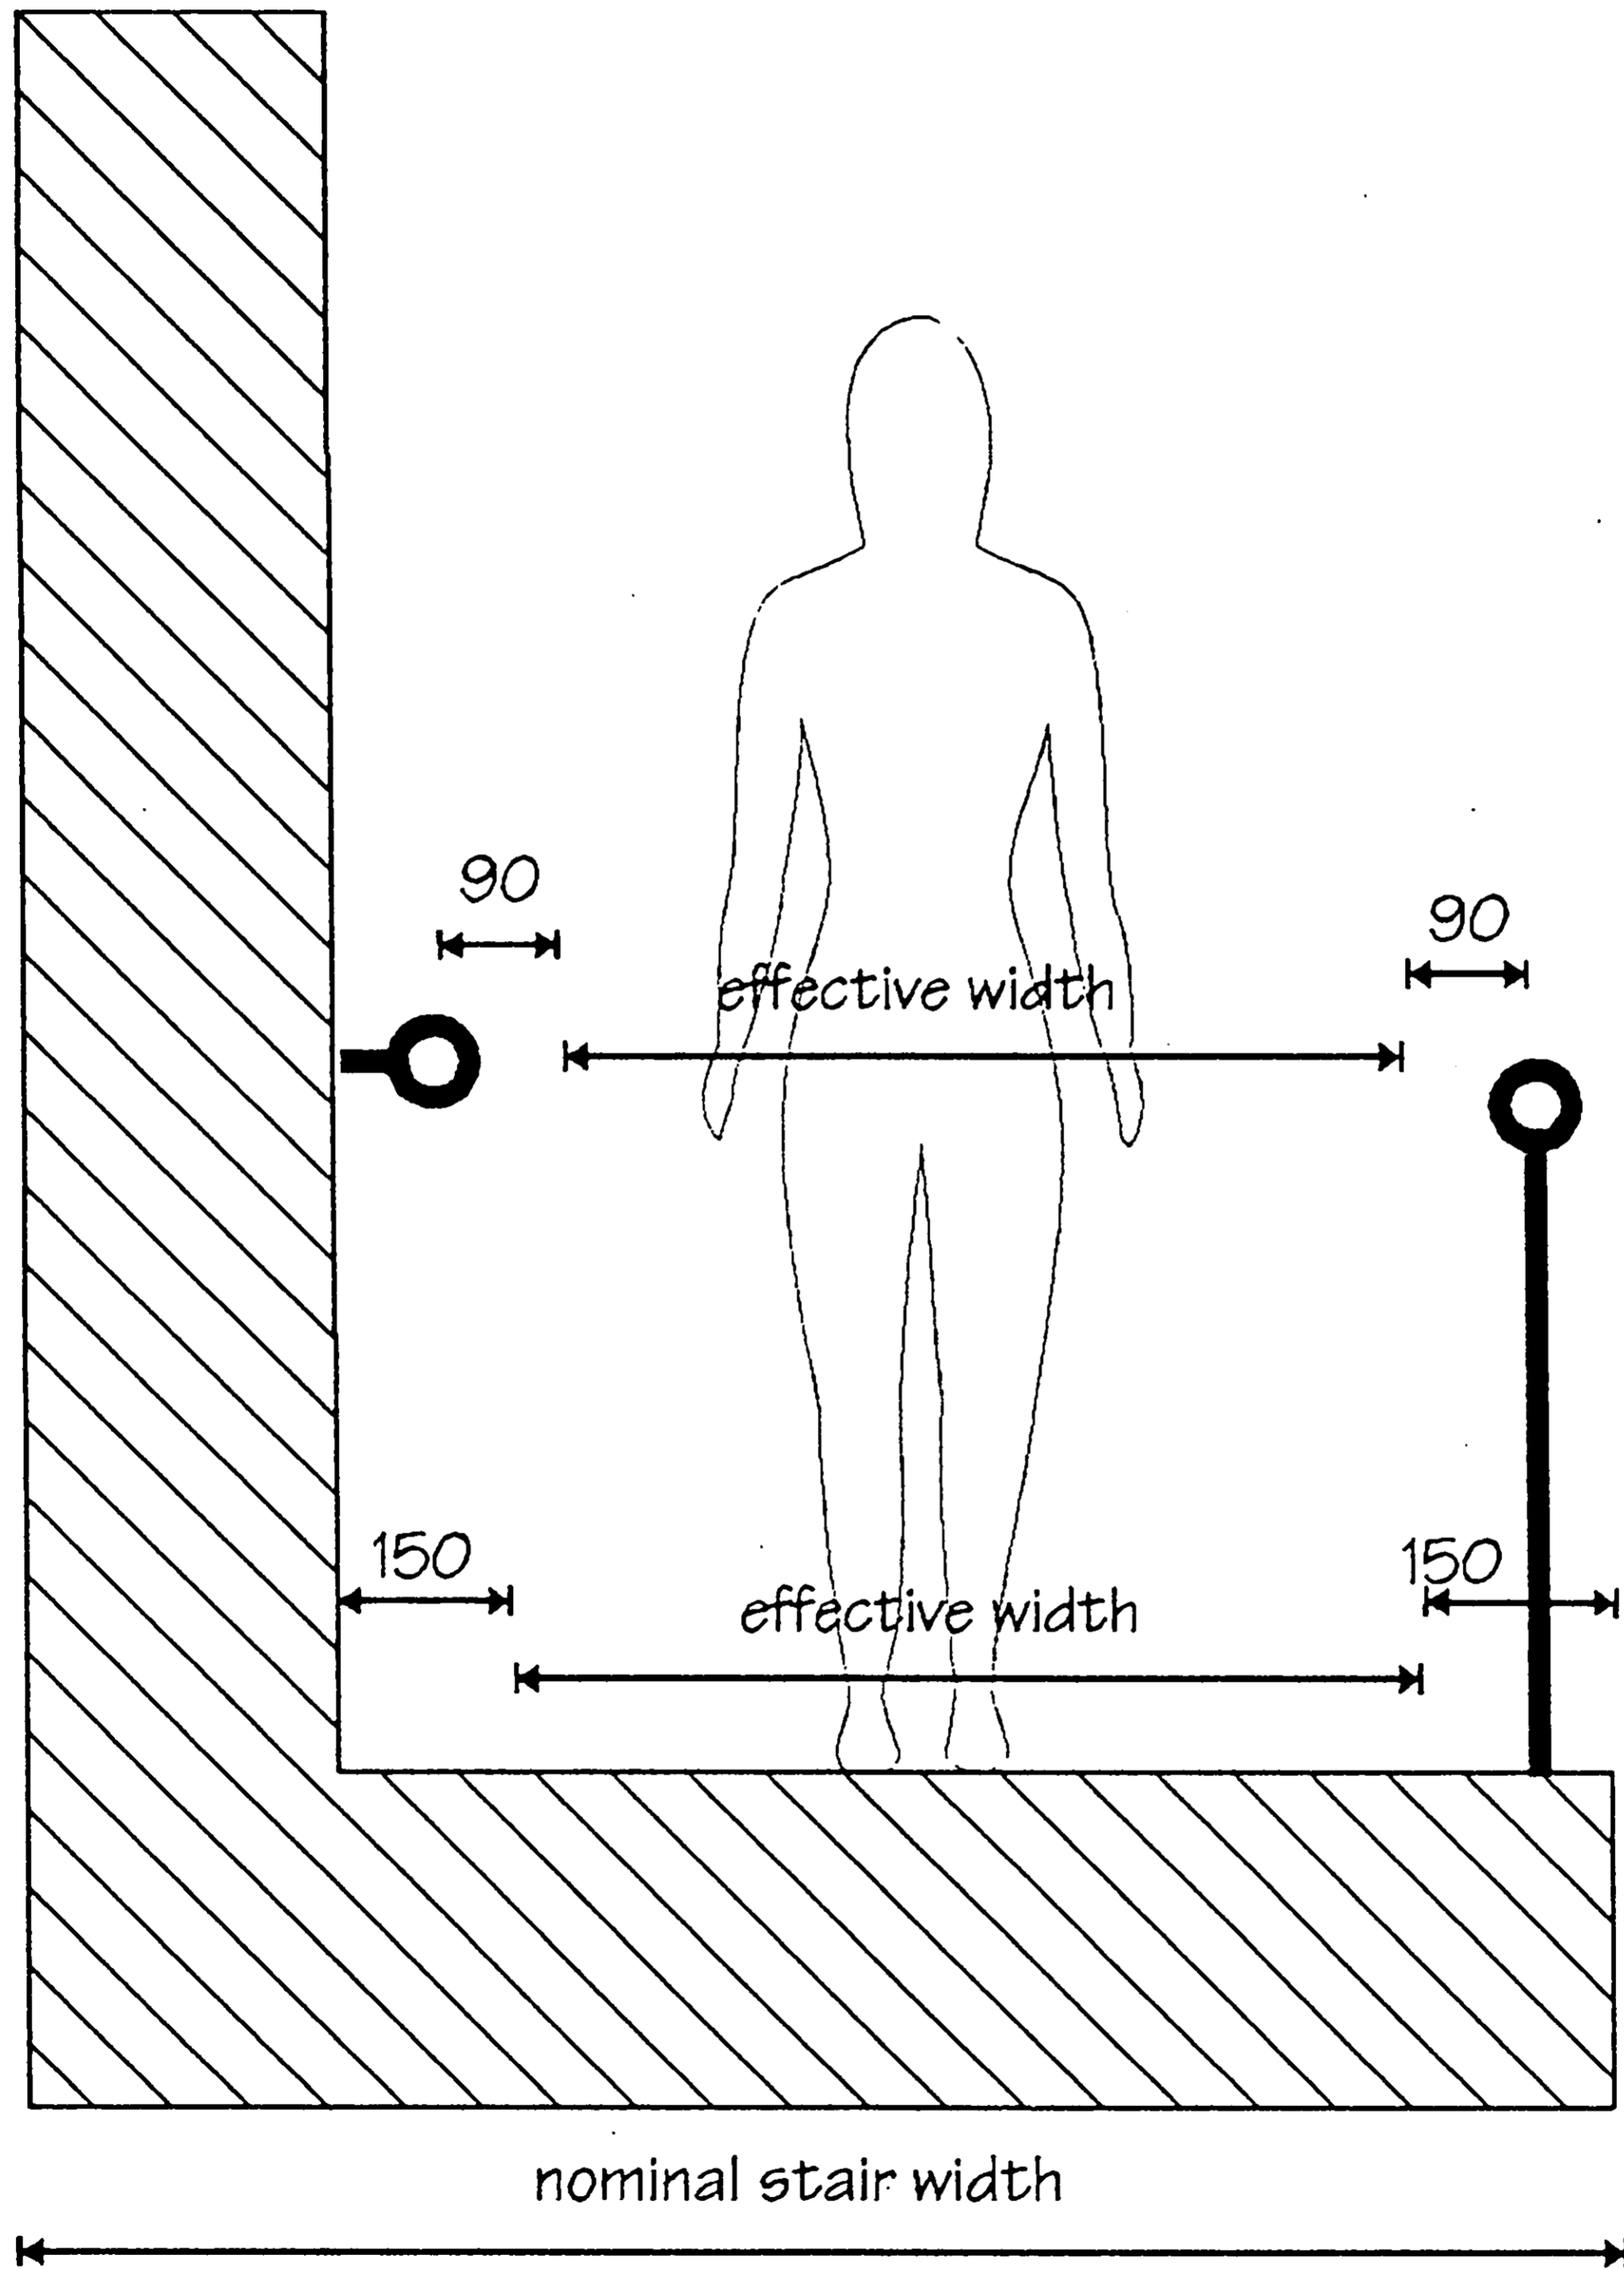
Measurement of effective stair width in relation to walls and handrails
